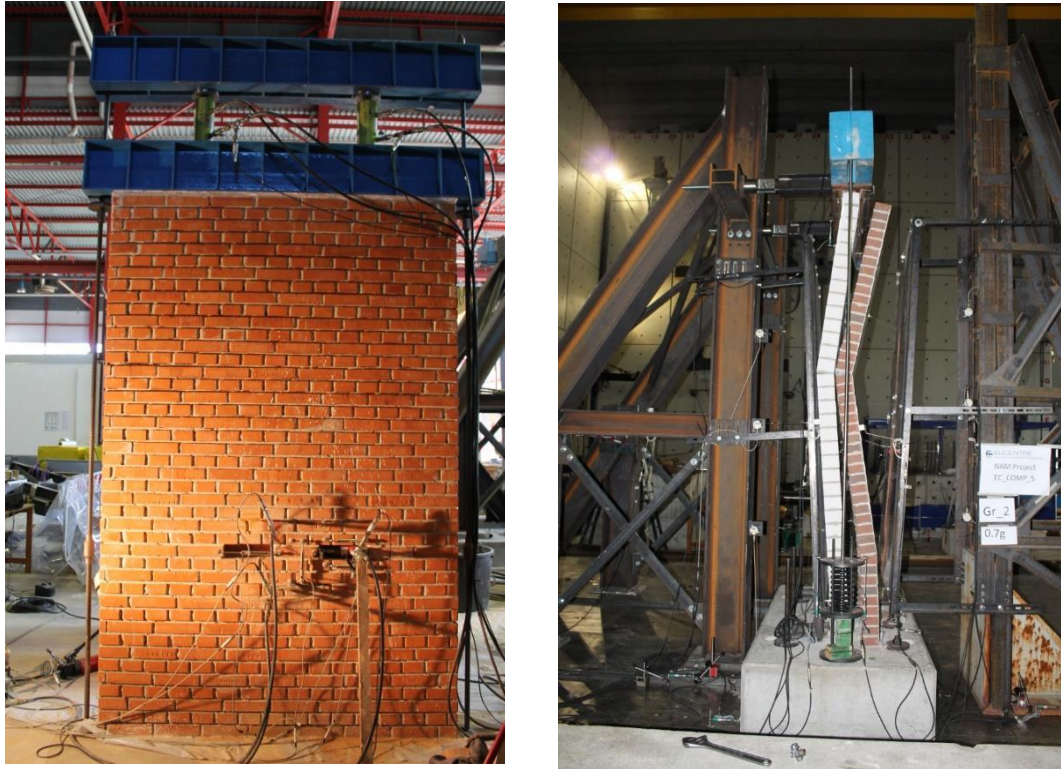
Static in-plane masonry wall setup (left) and cavity wall out-of-plane dynamic test failure (right)
